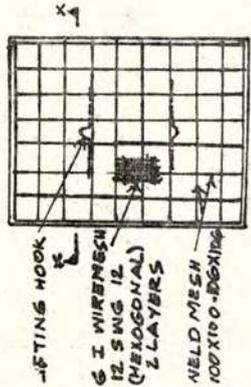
FIG. DETAILS OF WELDED MESH FOR CIRCULAR TANK TYPE 'B'
